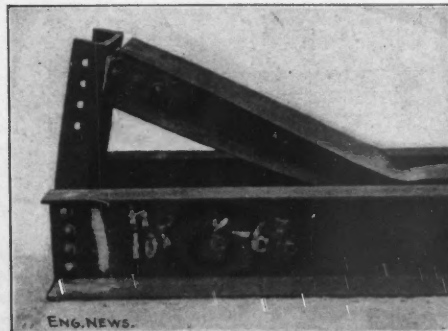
Condition of Connecting Angles on 6-in. I-Beam After Failure of Beam.
